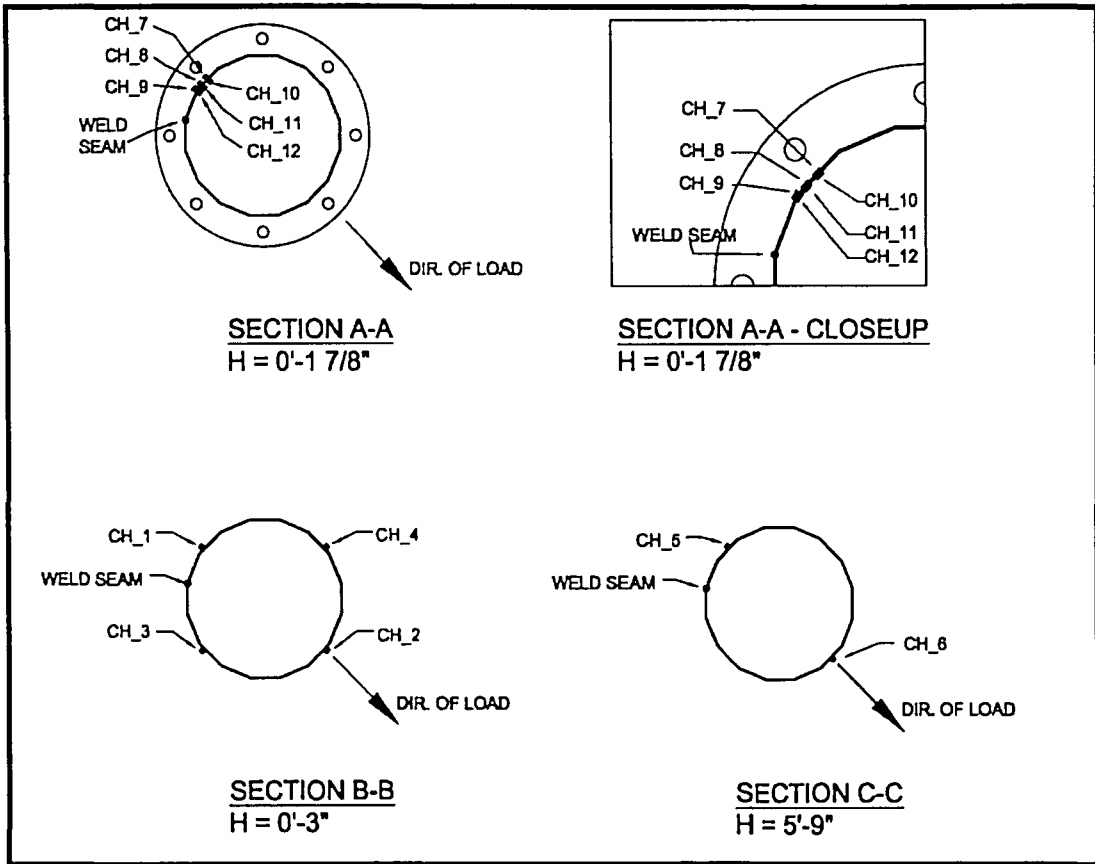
Strain gage details for the As-built tower along I-29 in Sioux City, Iowa
